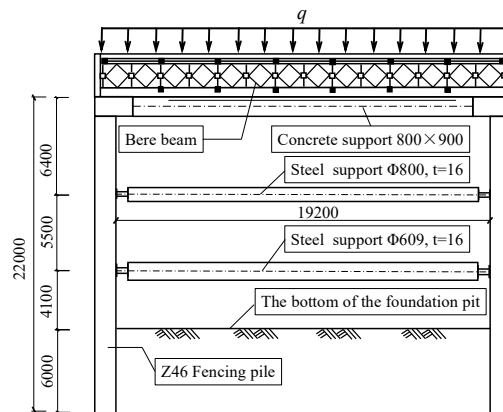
Sectional view of retaining structure of foundation pit under vertical load.
